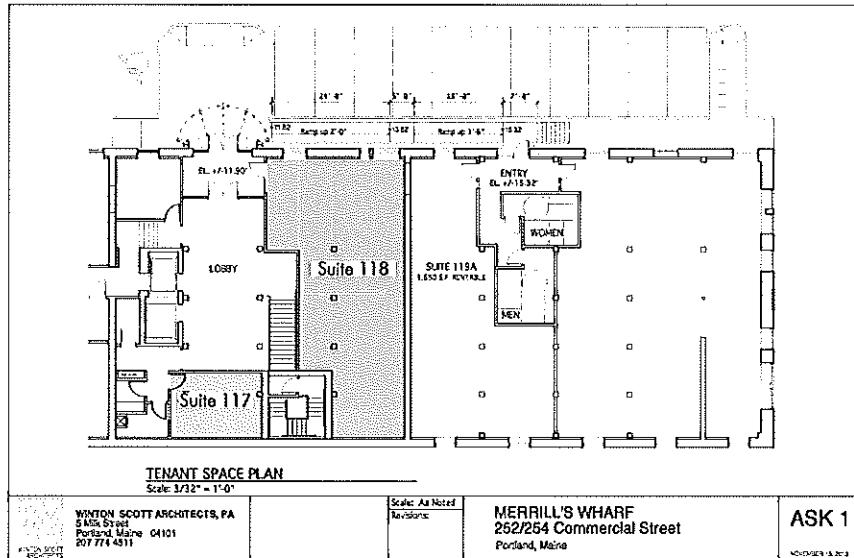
| 254 Commercial Street, Suite 117 and 118 Floor Plan
